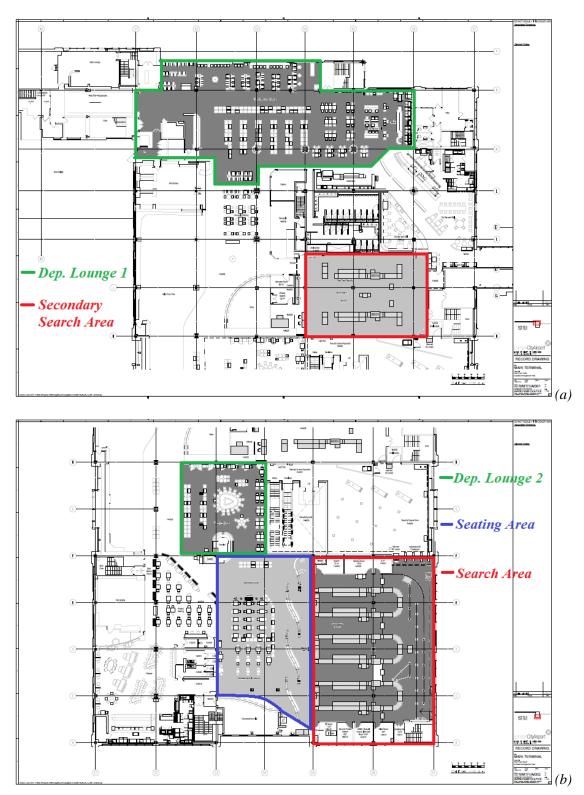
LCY first floor plan (a) north: secondary search area and departures lounge, (b) south: main search area, seating area and departures lounge 2.
